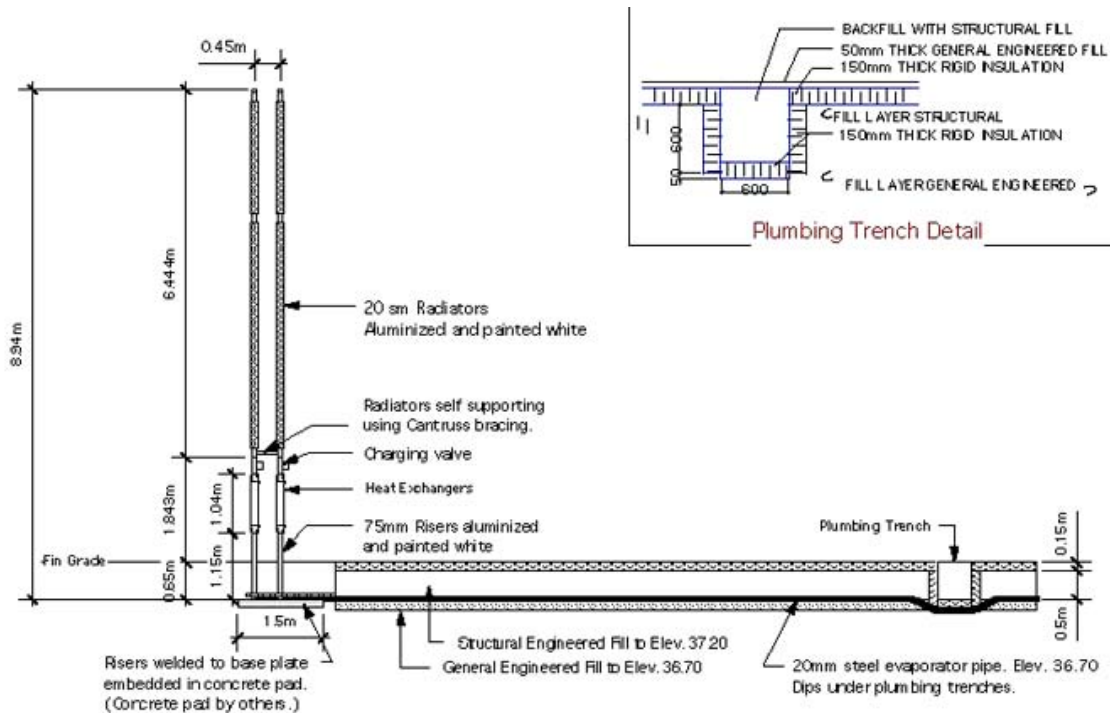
Section showing the evaporator pipe in respect to the slab-on-grade foundation, insulation and the services (plumbing) trench, FYOF, Inuvik, NT
